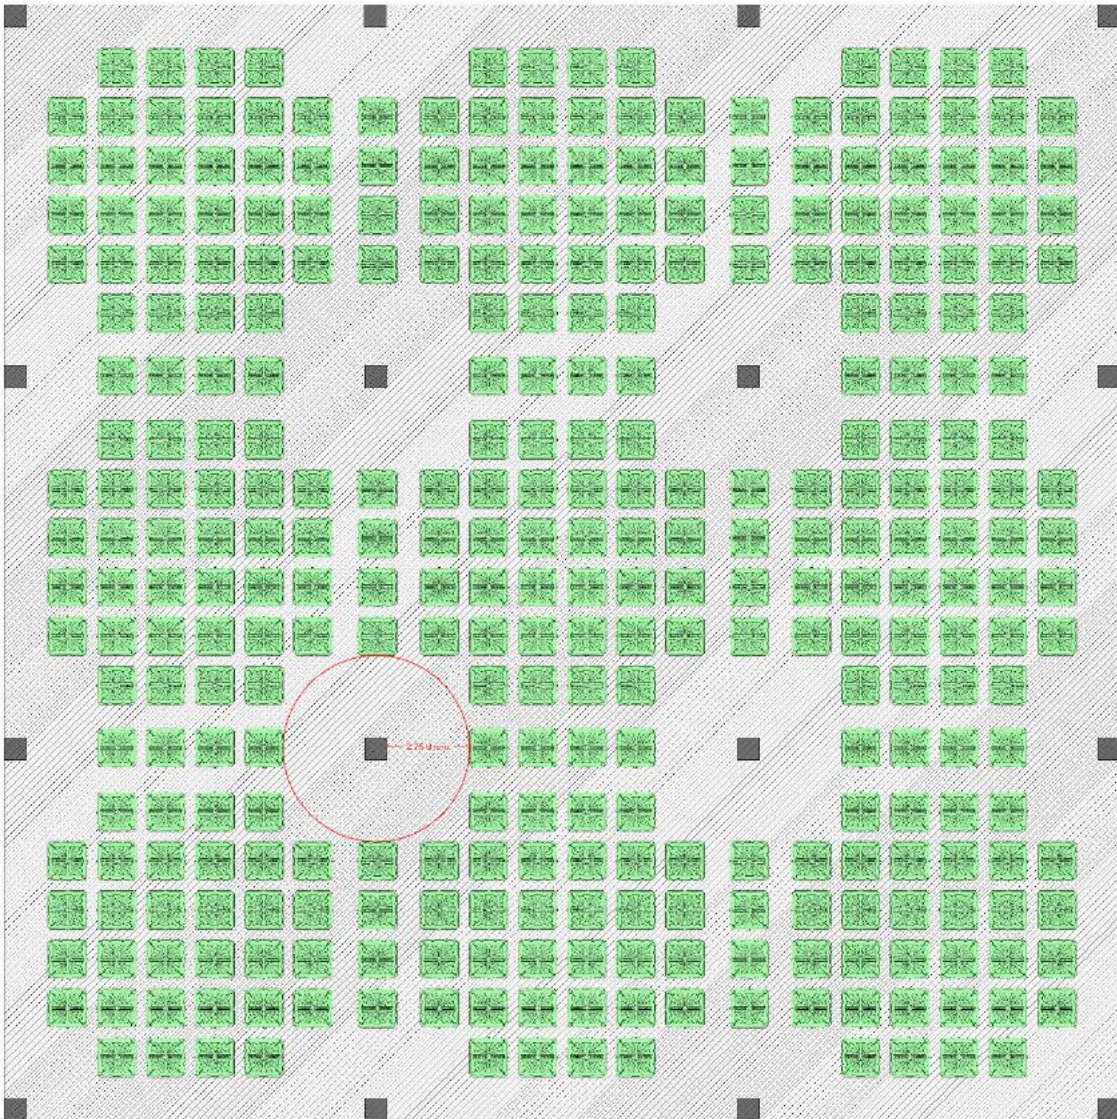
Typical layout of lightenings with massive zones over the pillars
